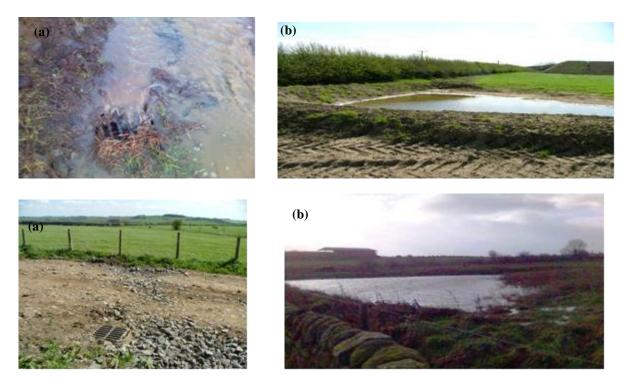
(a) Road drains that divert road runoff into infiltration ponds; (b) infiltration ponds
